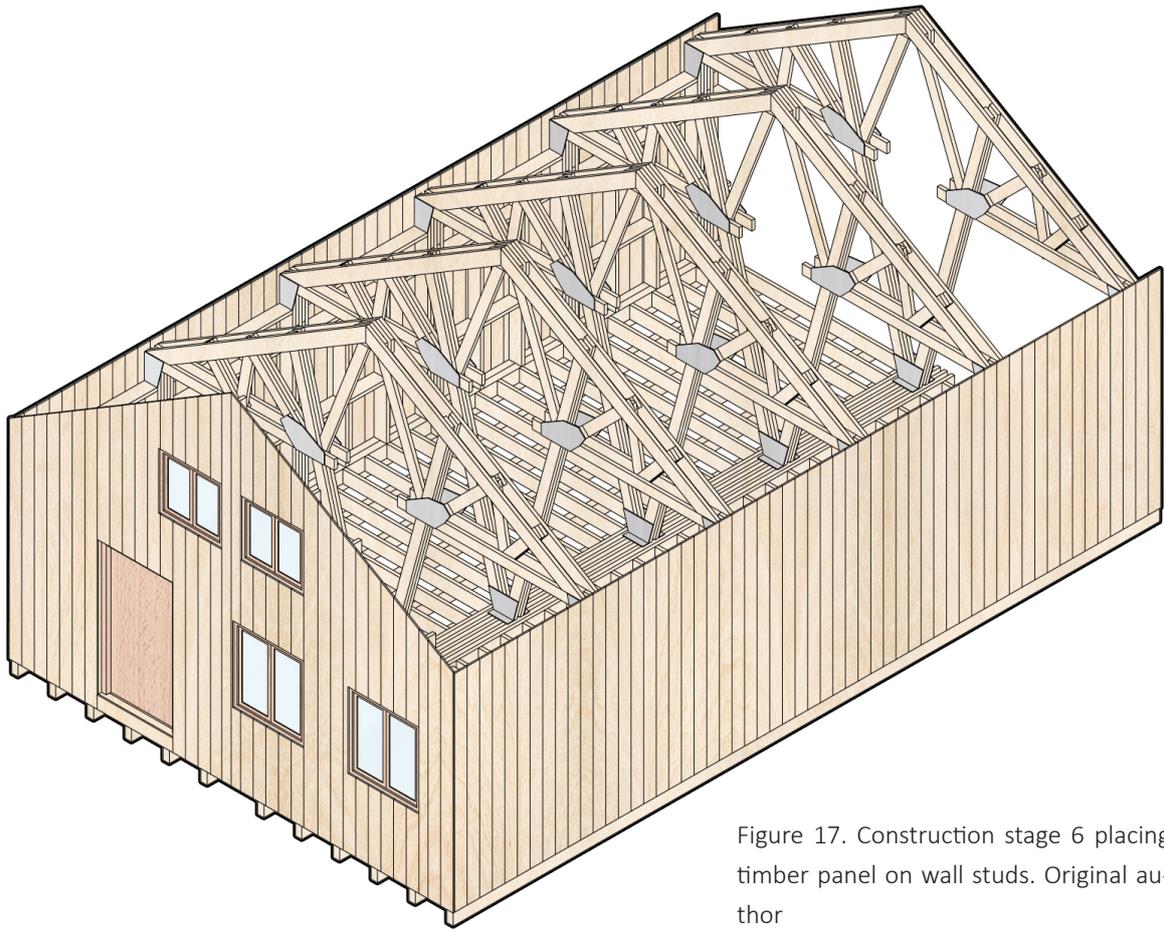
Construction stage 6 placing timber panel on wall studs. Original author
